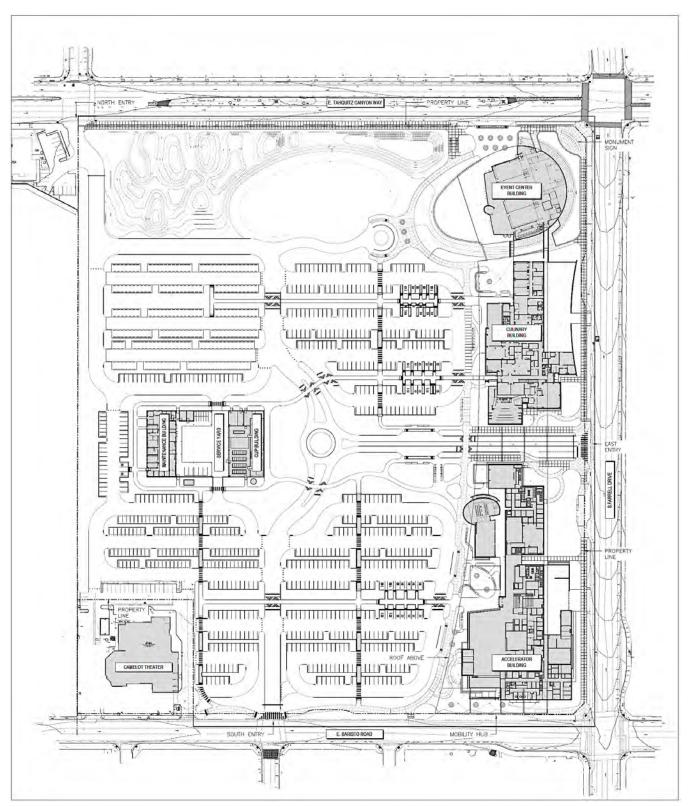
Exhibit A: COD West Valley Campus - Development Plan Amendment No. 1 Site Plan
